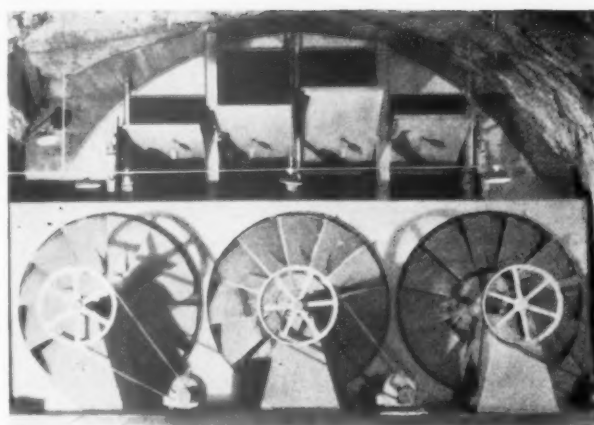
EXHAUST AIR FANS USED IN VENTILATING THE WAWONA TUNNEL.
